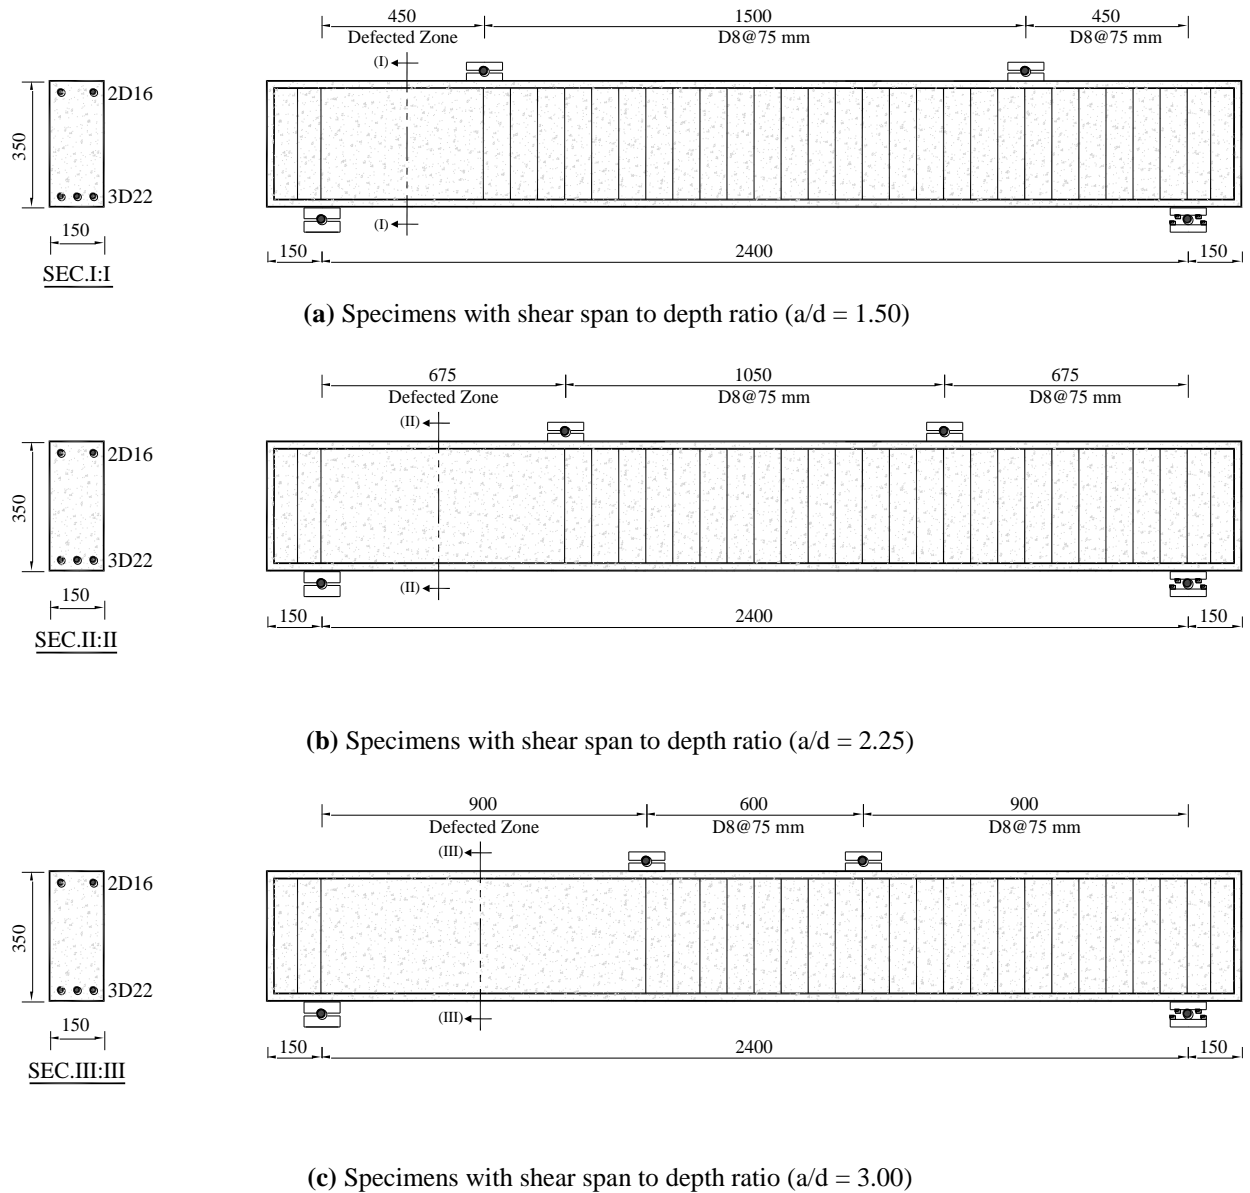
Geometry and internal steel reinforcements of the tested specimens (All dimensions in mm).
